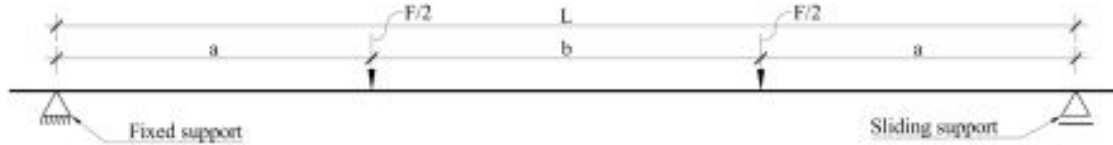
Full-scale flexural failure tests: 4-point bending load configuration.
